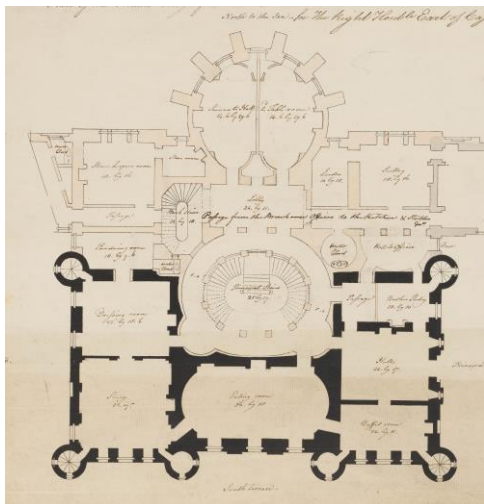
Robert Adam, "Culzean Castle Principle Ground Floor Plan." The eating room is at the bottom center of the image.
